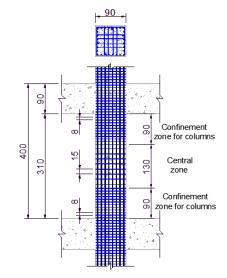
Layout of non-ductile confinement for columns, 15-story model, α =0.25, β =0.50, units: cm
